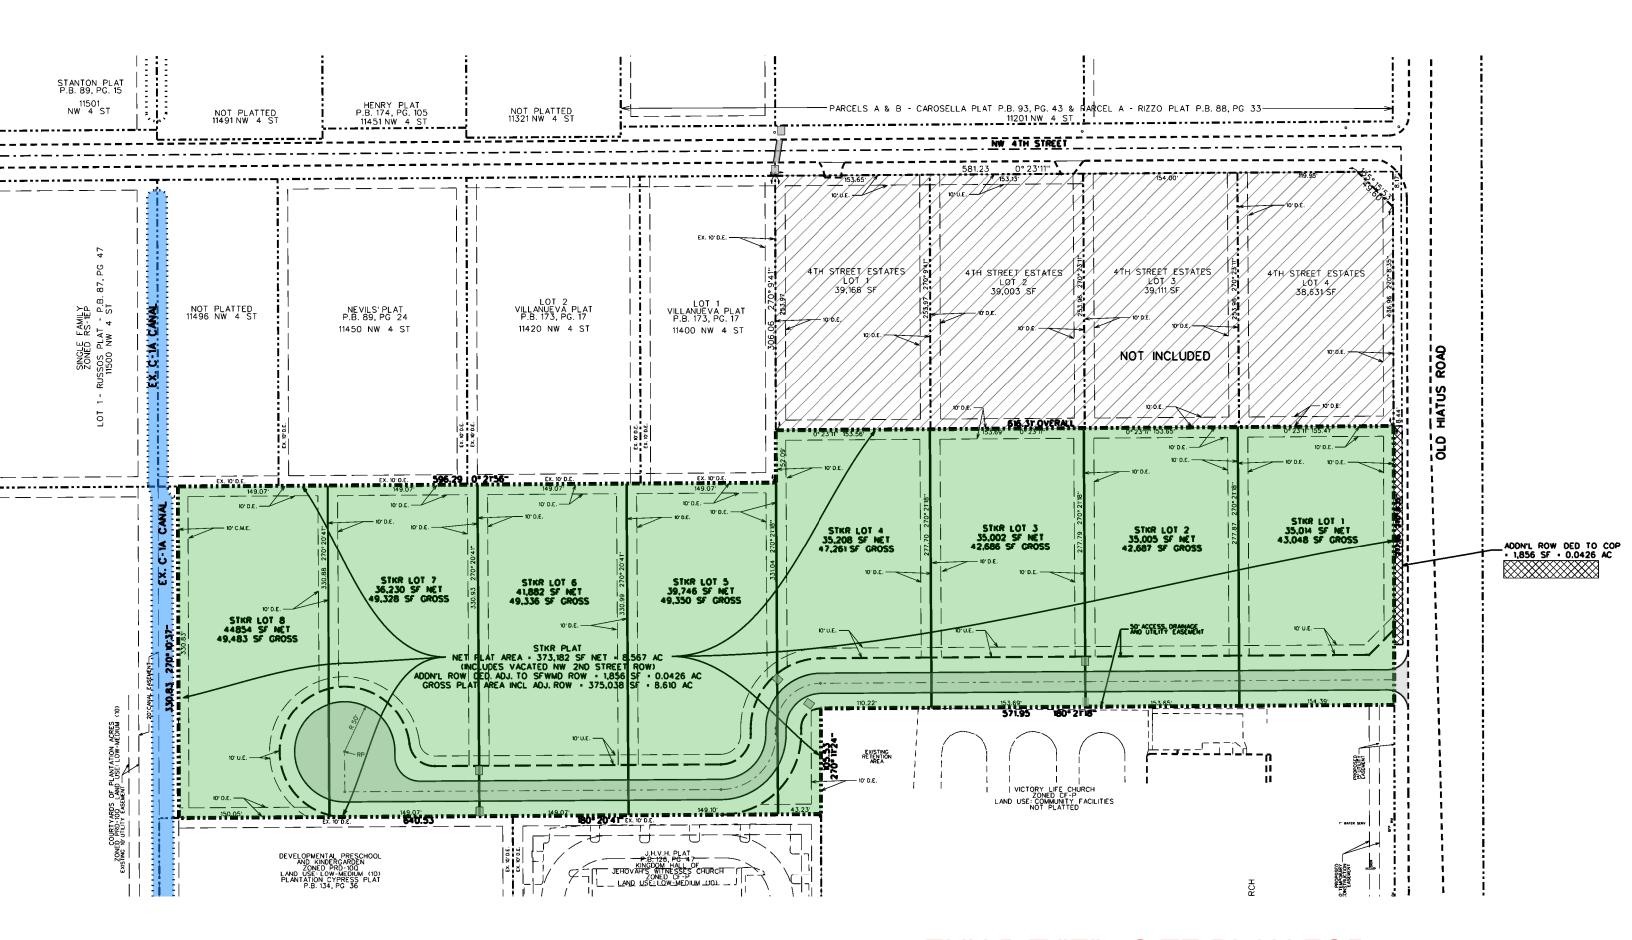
EXHIBIT "E" - SITE PLAN FOR STKR 8 LOT PLAT
